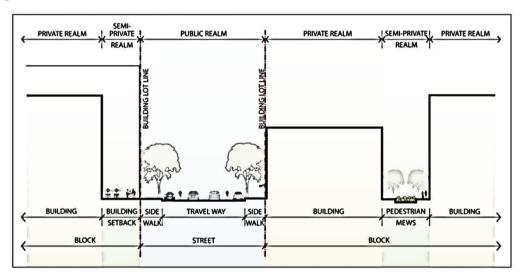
shows the structure for the designing of the blocks, buildings and the surrounding voids, which is based on:
